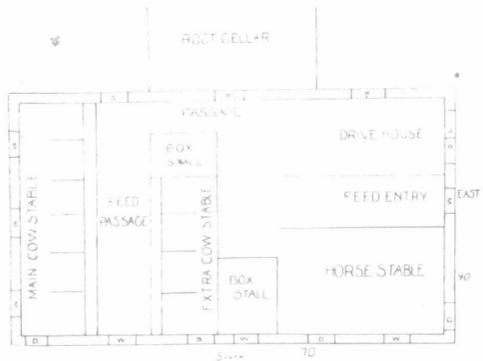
Plan of stables at Weldwood before rearrangement.
